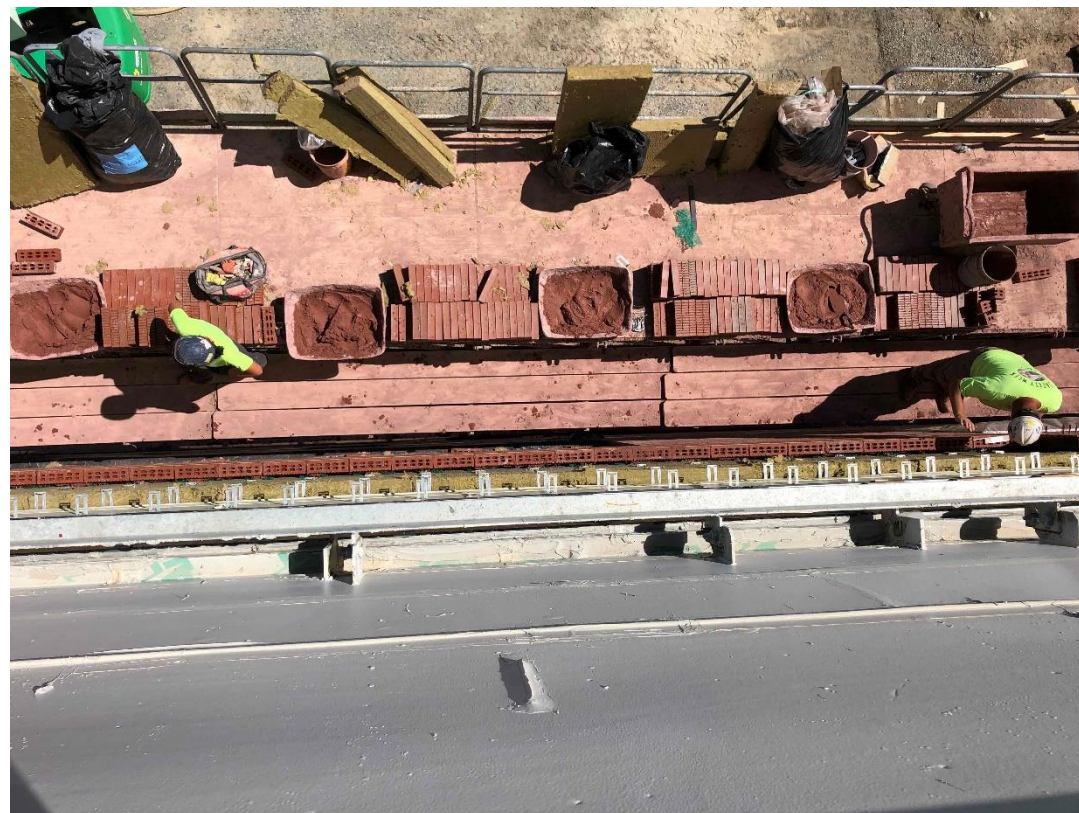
Two Masons Install Bricks at Building A East Elevation.
